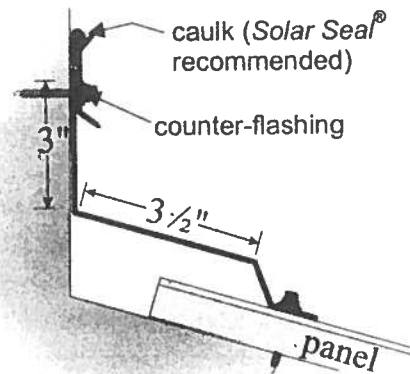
As with the ridge cap, the ENDWALL FLASHING above can be sealed using outside closures.
